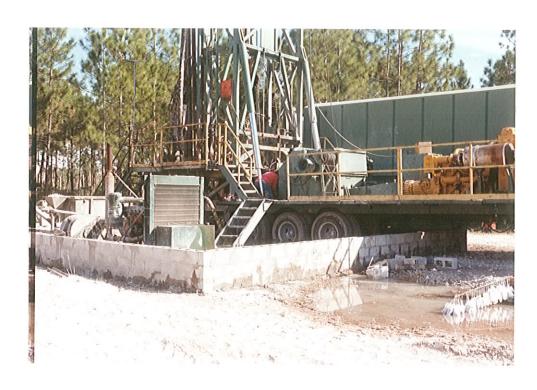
Drill rig work area surrounded by concrete block wall for water control \$CO-2081\$
